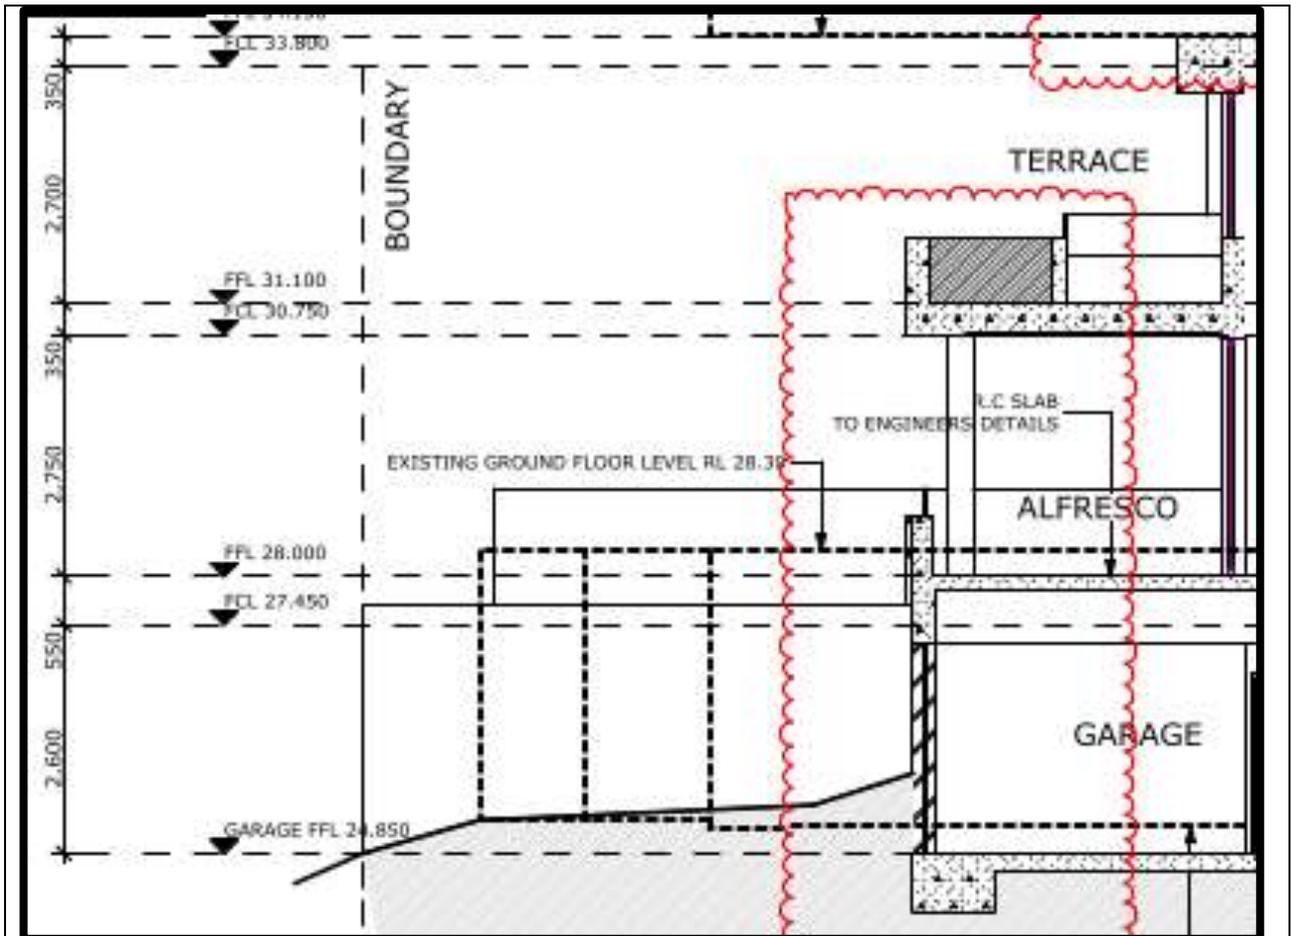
Extract of the cross section of the proposed dwelling fronting Boronia Street, Kyle Bay (Source: David Dechiara, 2020).
